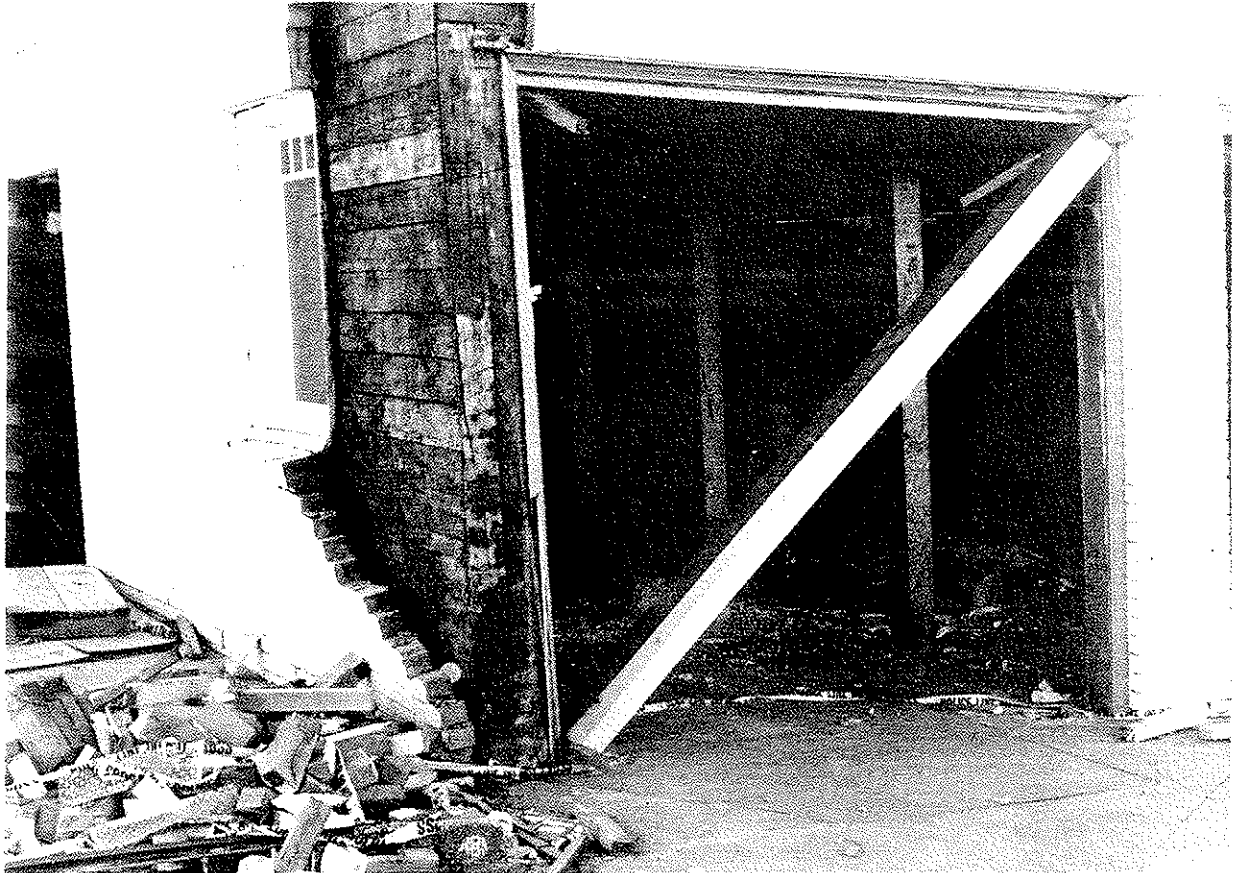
Corner apartment building in the Marina district. The masonry veneer was anchored to the sheathing by nails embedded in the mortar. House movers have shored the garage level in preparation for restoring the building.
